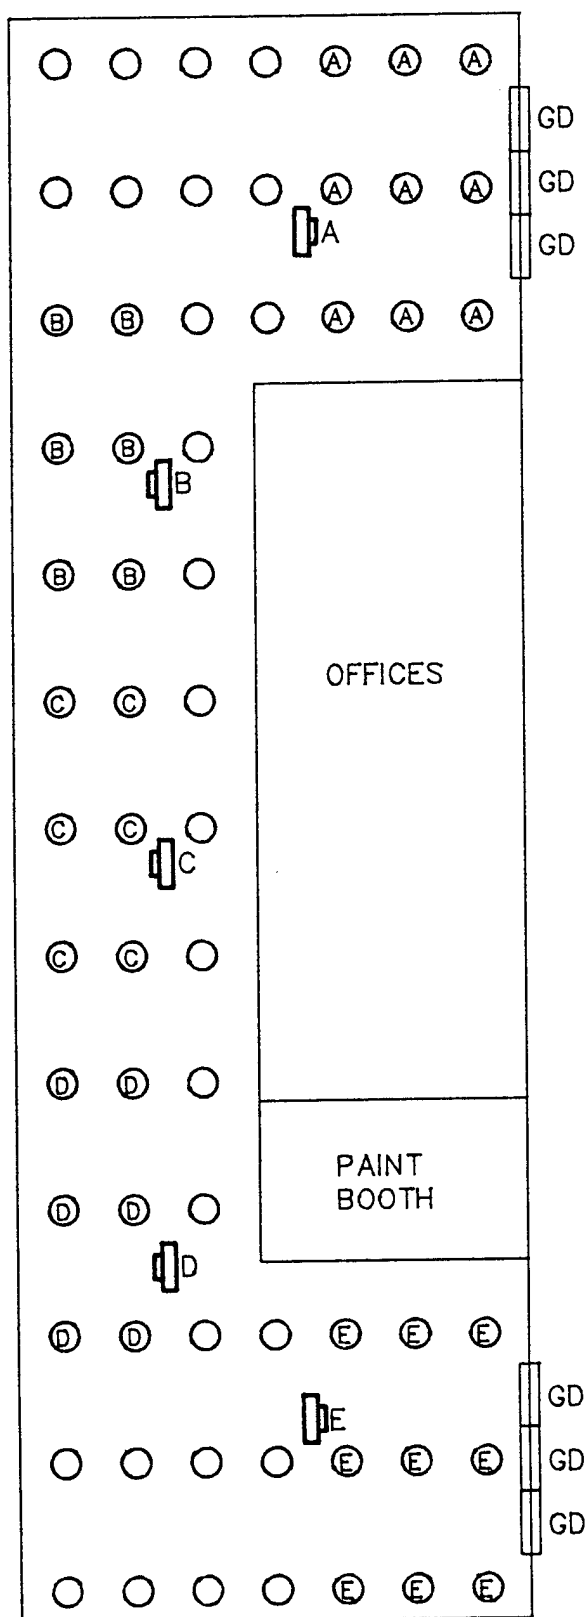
PHOTOCELL CONTROL LAYOUT - BUILDING 2944
